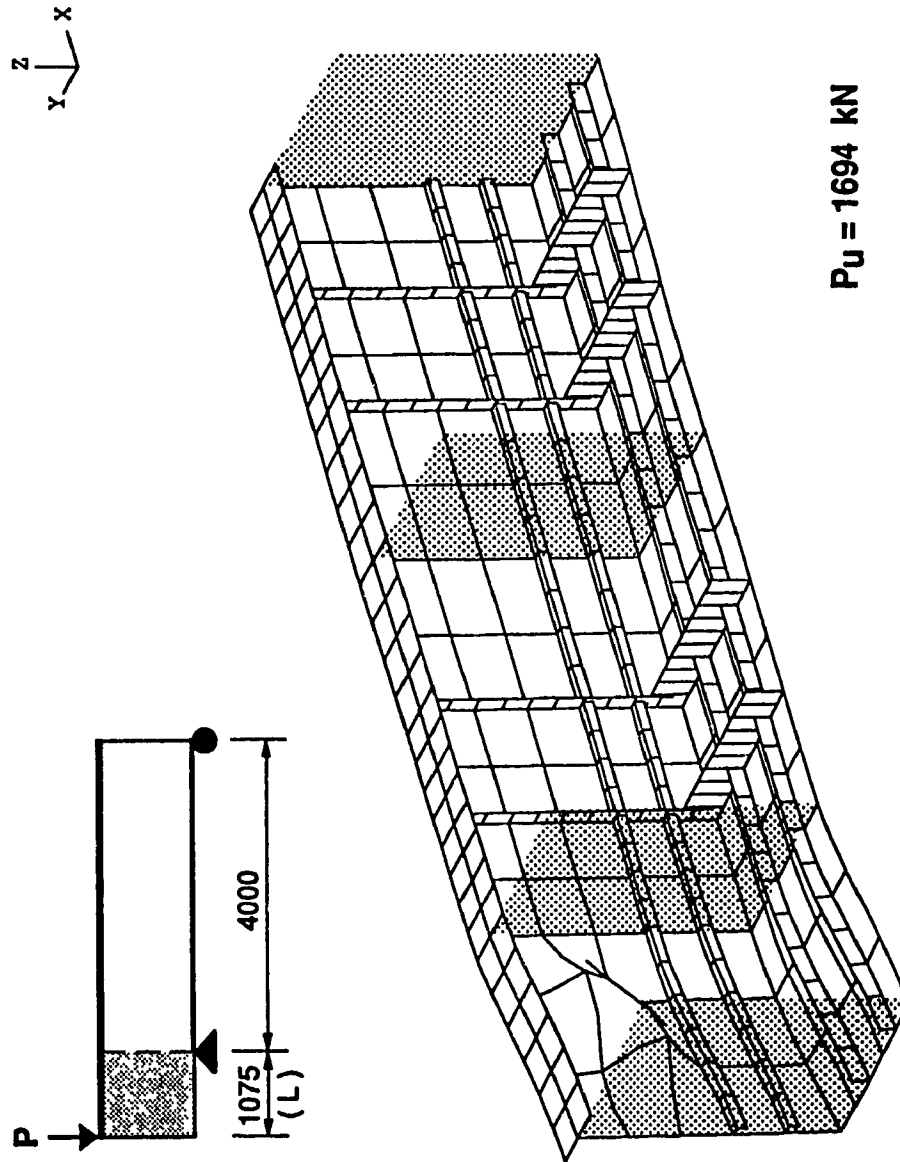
Failure of Box Girder Type A with Web Stiffening Type 3.c.(ii)
